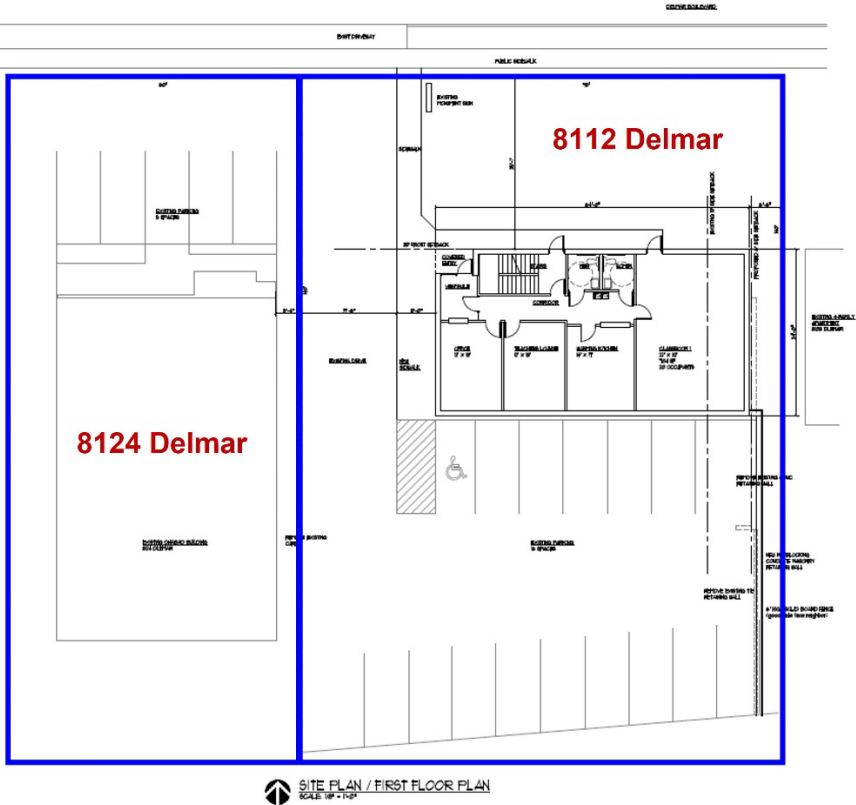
Site layout of 8112 and 8124 Delmar Boulevard.
